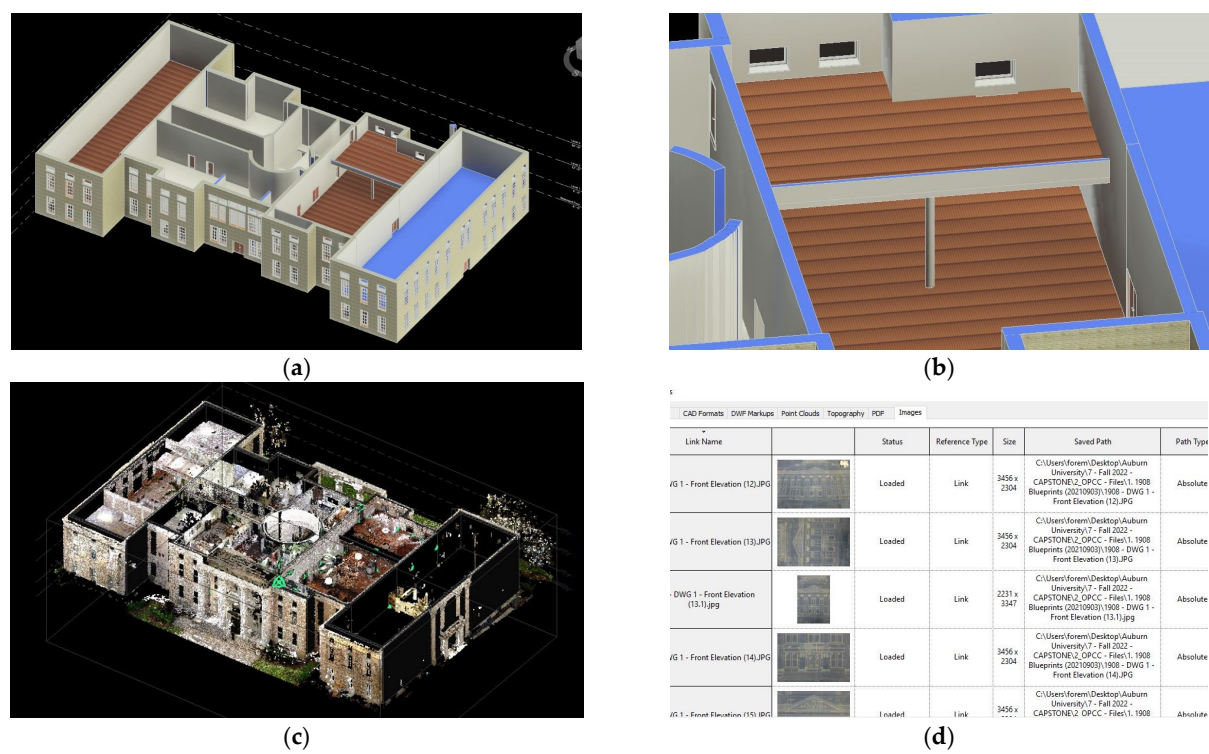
Demonstration of the HBIM “General Model” supplement to LOD 200: (a) 3D model detail of main building elements in Revit; (b) main building elements of the 1908 courtroom were created; (c) model imposed with TLS point cloud; (d) a view showing incorporation of the 1908 blueprints as general conservation documentation to the model in Revit.
